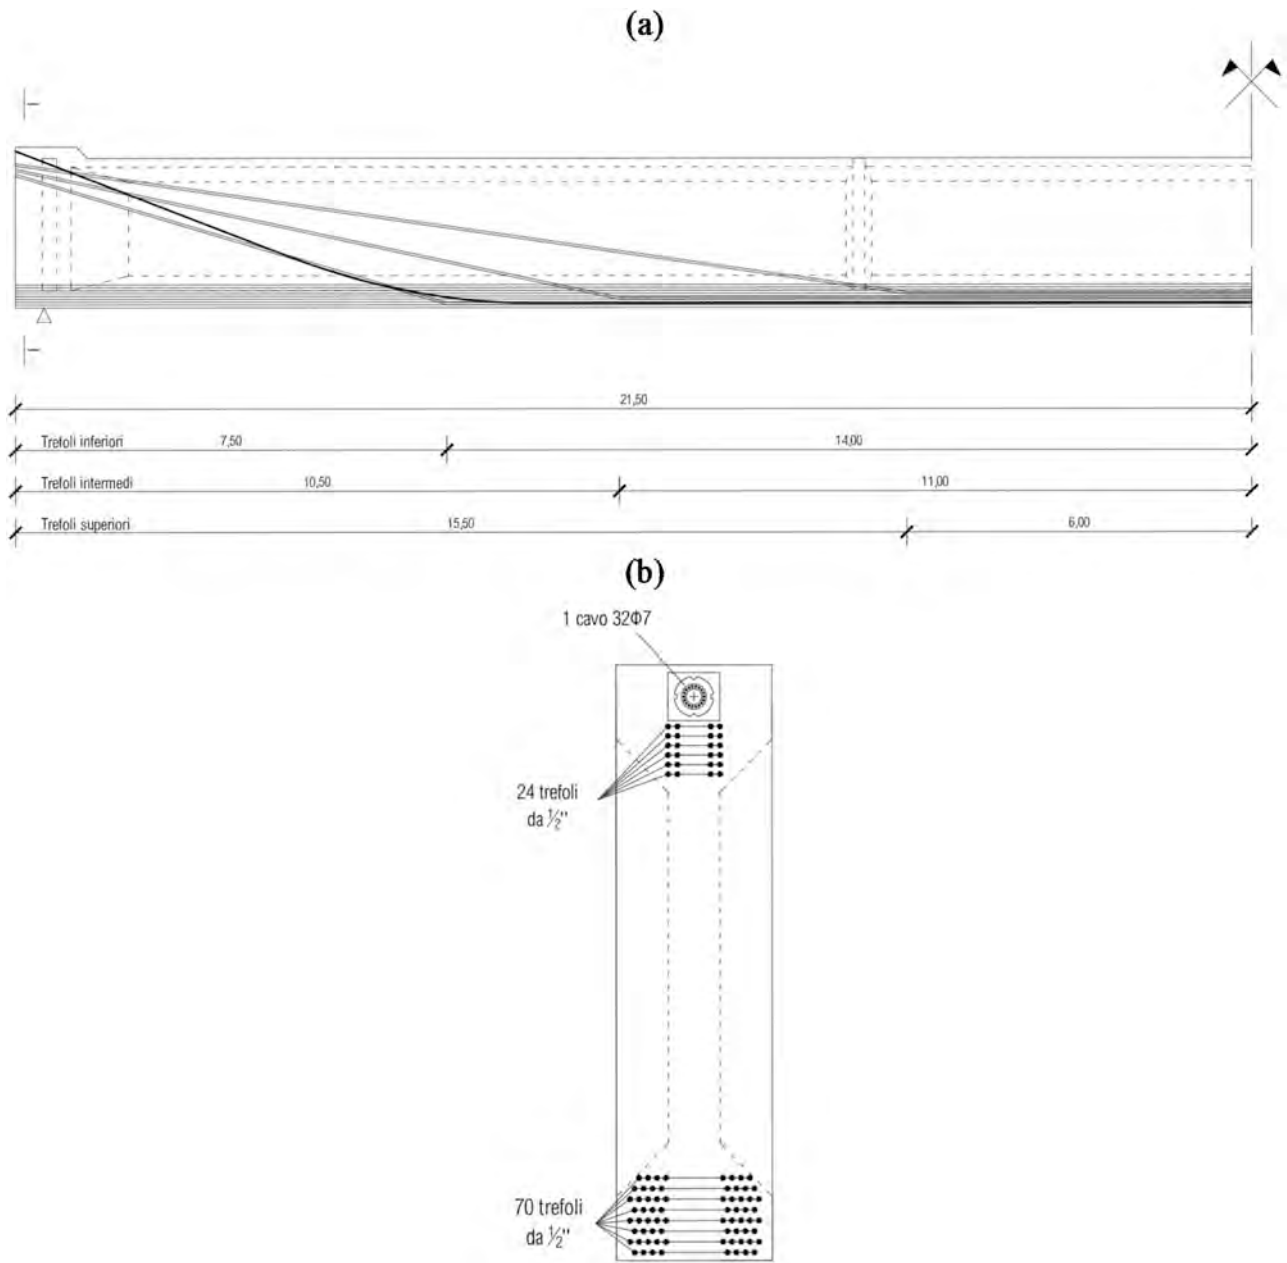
Pre and Post-tension reinforcement arrangement in longitudinal beam: (a) longitudinal view, (b) cross-section I-I. Measurements in metres with diameters in millimetres or inches.
